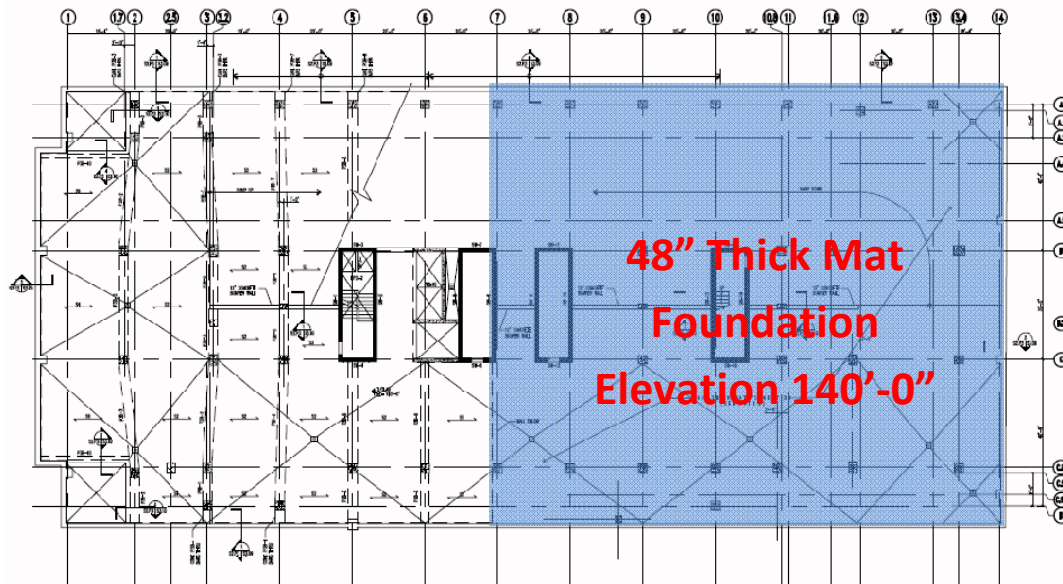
3rd Level of Parking Garage with General Mat Foundation Location
